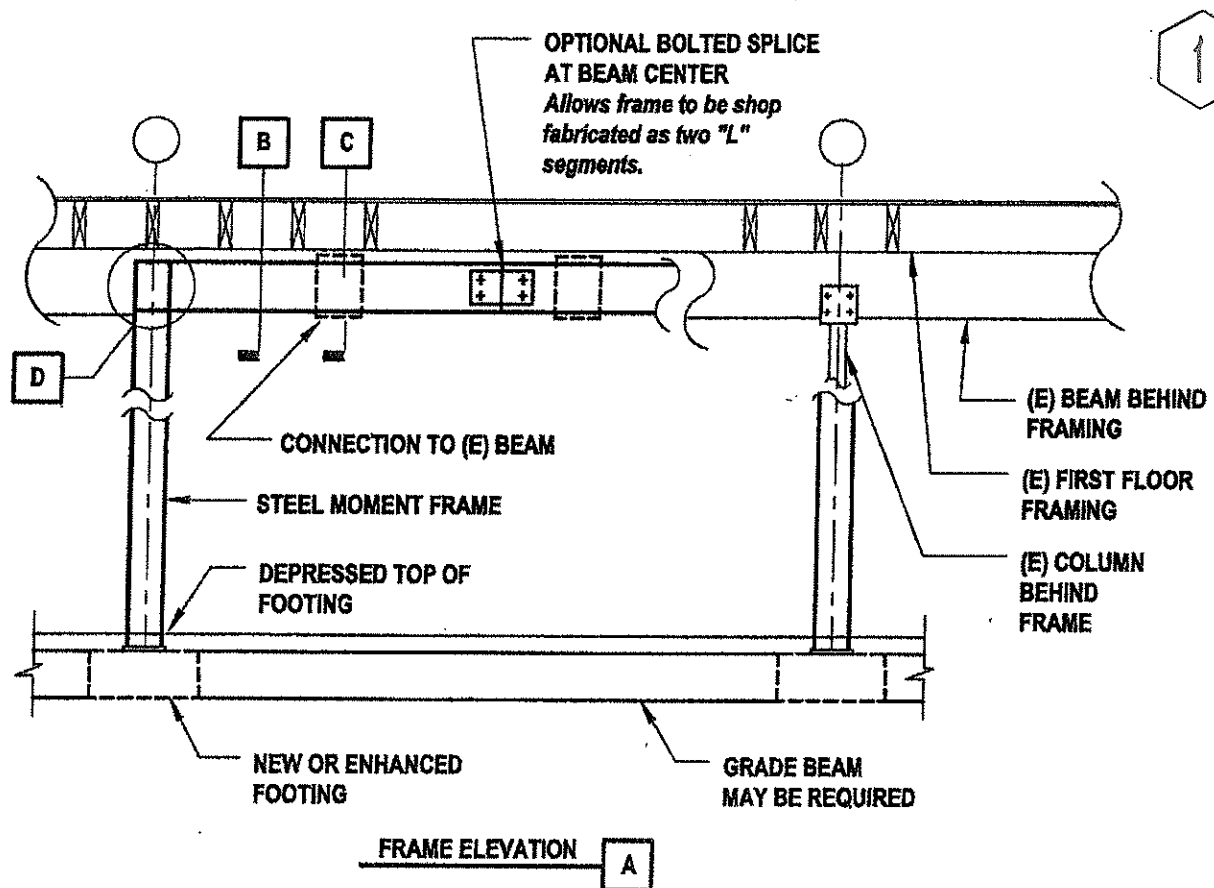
A: Elevation of Steel Moment Frame in W1A Building
